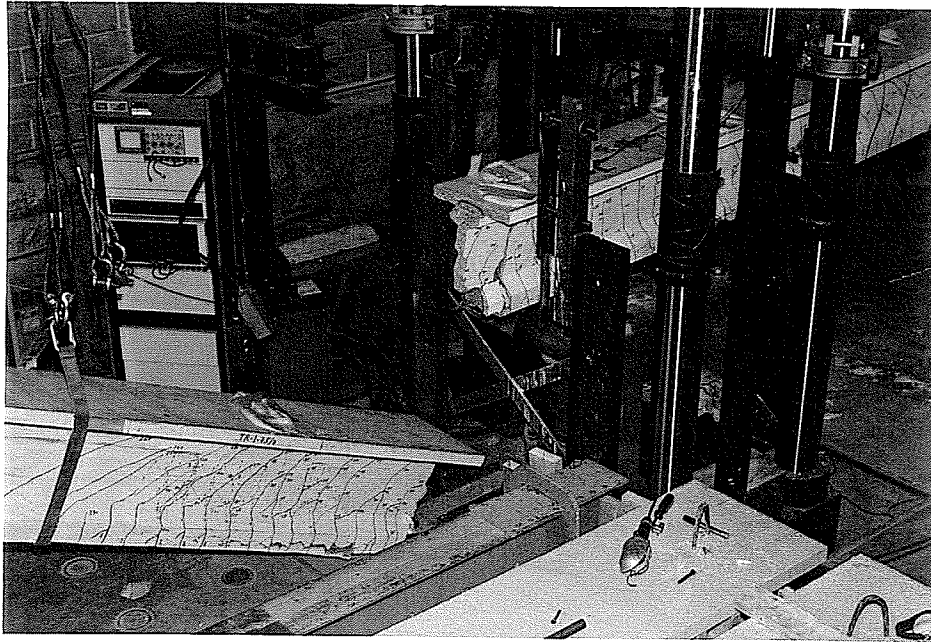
(a) Failure mode of beam TR-1-7.5/7
